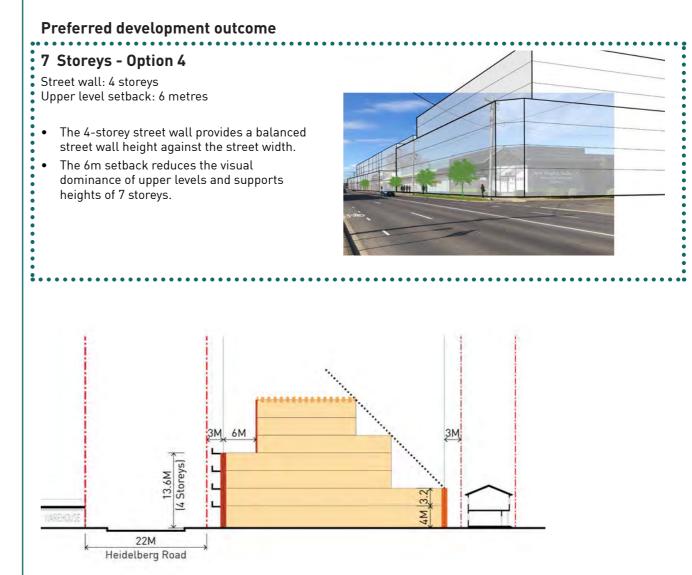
Proposed building envelope controls for Precinct 3B (718 Heidelberg Road)
